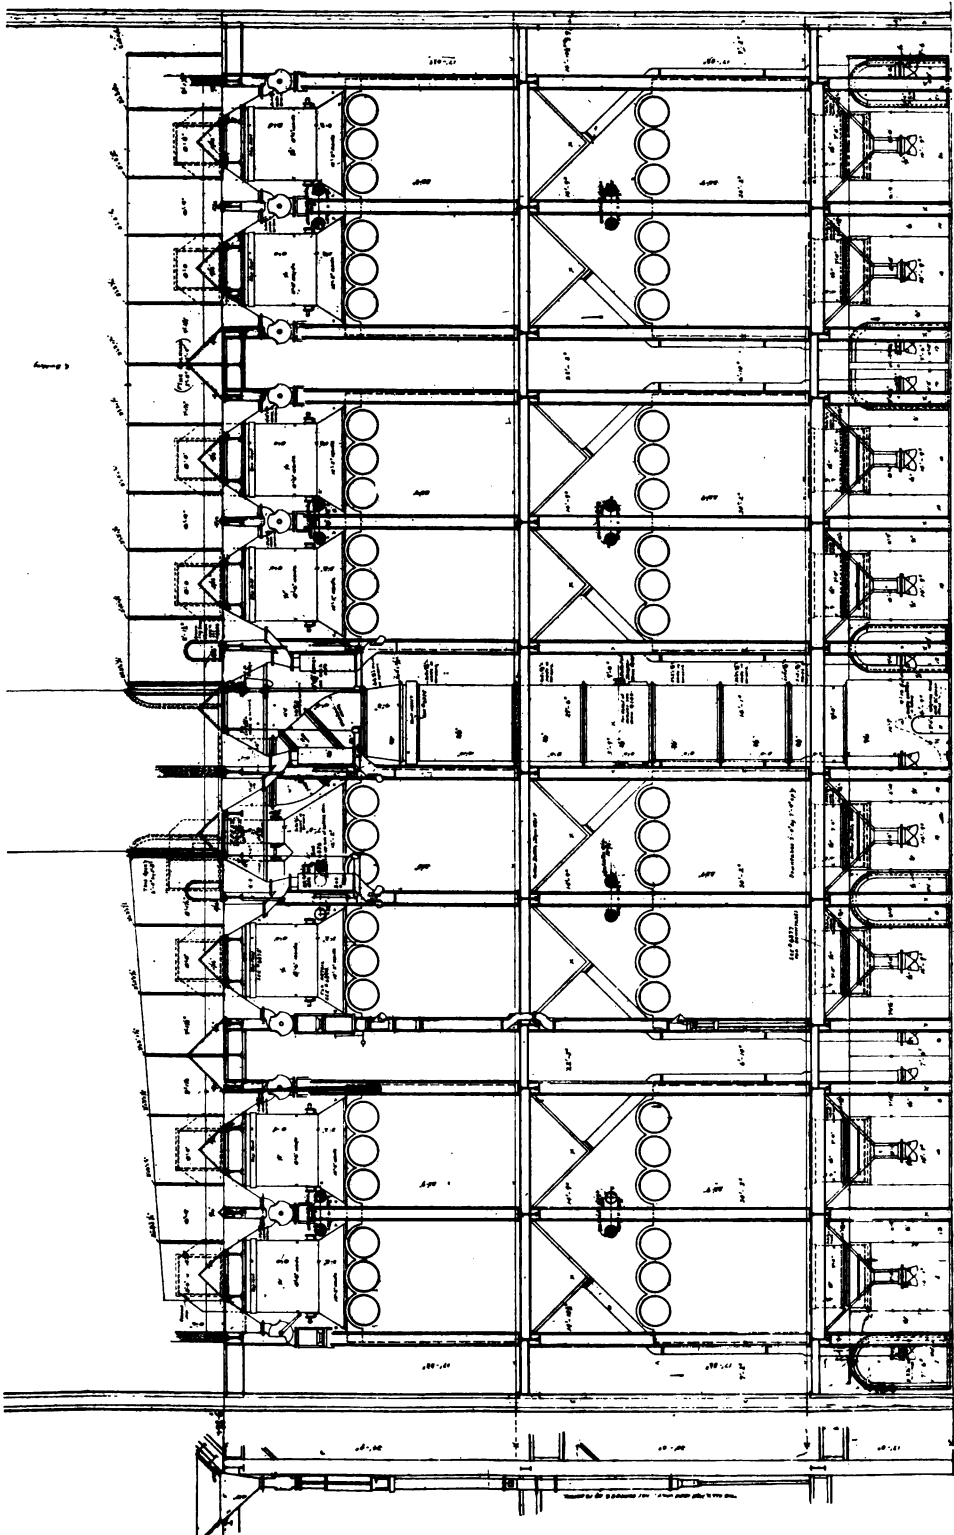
Longitudinal Section of Boiler House, Central Power Station, B. R. T.
